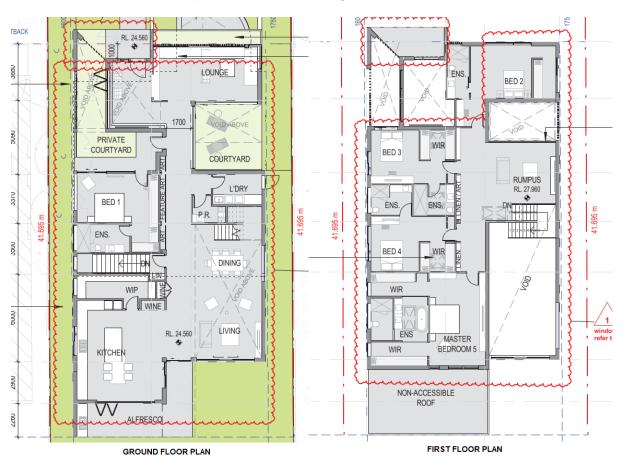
Extract of the floor plans in the modification application (source: Dreamscapes Architects, dated 22/04/2020)
